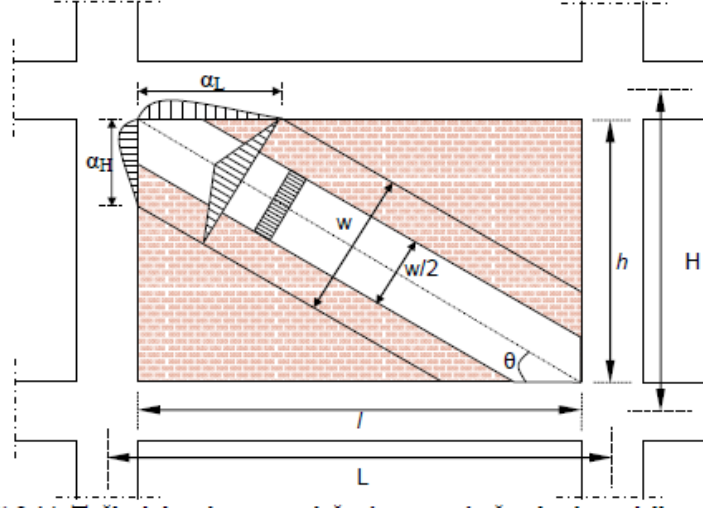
Modeling of brick infill wall as equivalent pressure strut.
